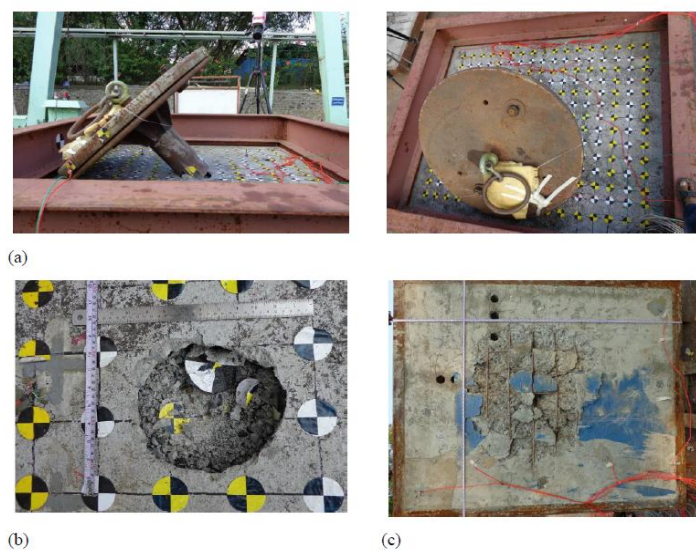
Slab Damage Profile: (a) at the end of the impact test; details of (b) top and (c) bottom slab surface (Parmar et al., 2014)
